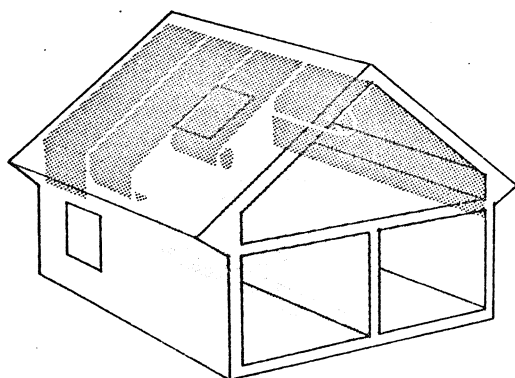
Line the ceiling with polyethylens sheet parallel to the roof trusses. Pass the rolls through an opening at the edge of the attic floor. The joints are to be laid over the supports with a good overlap and clamped with strips of plywood, or taped.
